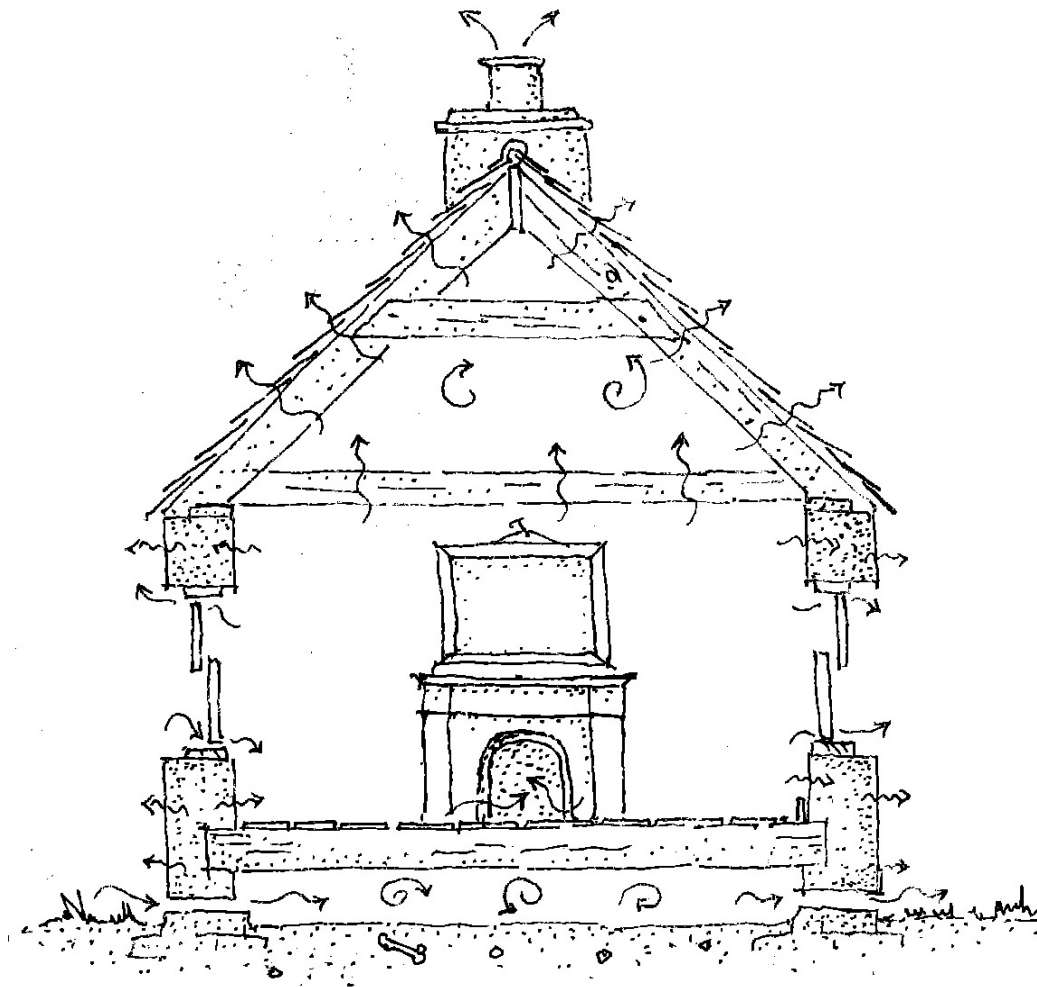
A simplified cross section through a notional traditional building, showing advection, infiltration and fabric diffusion paths.
